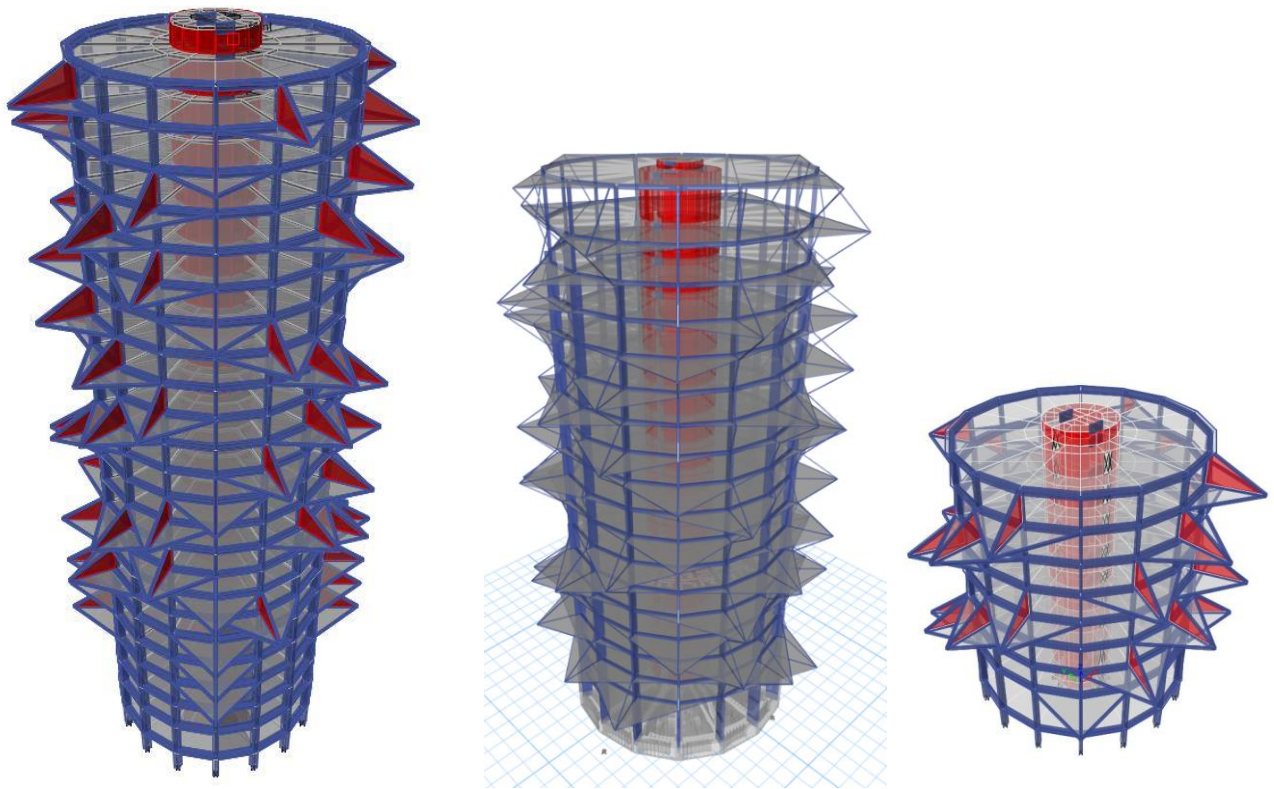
A Place To – ETABS model © BG&E and BIG Engineering
